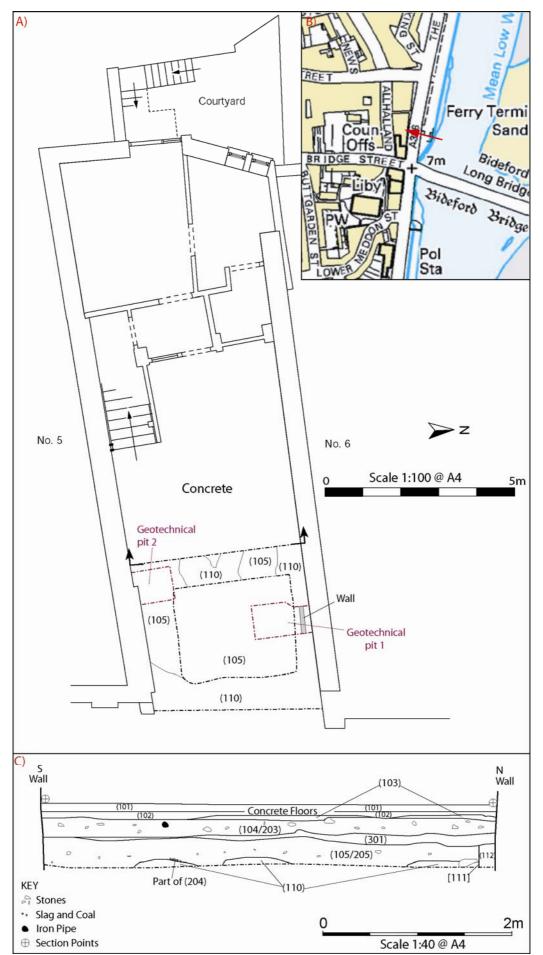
(A) Plan of the excavated areas; (B) Site location; (C) east facing section of the ring beam trench.
